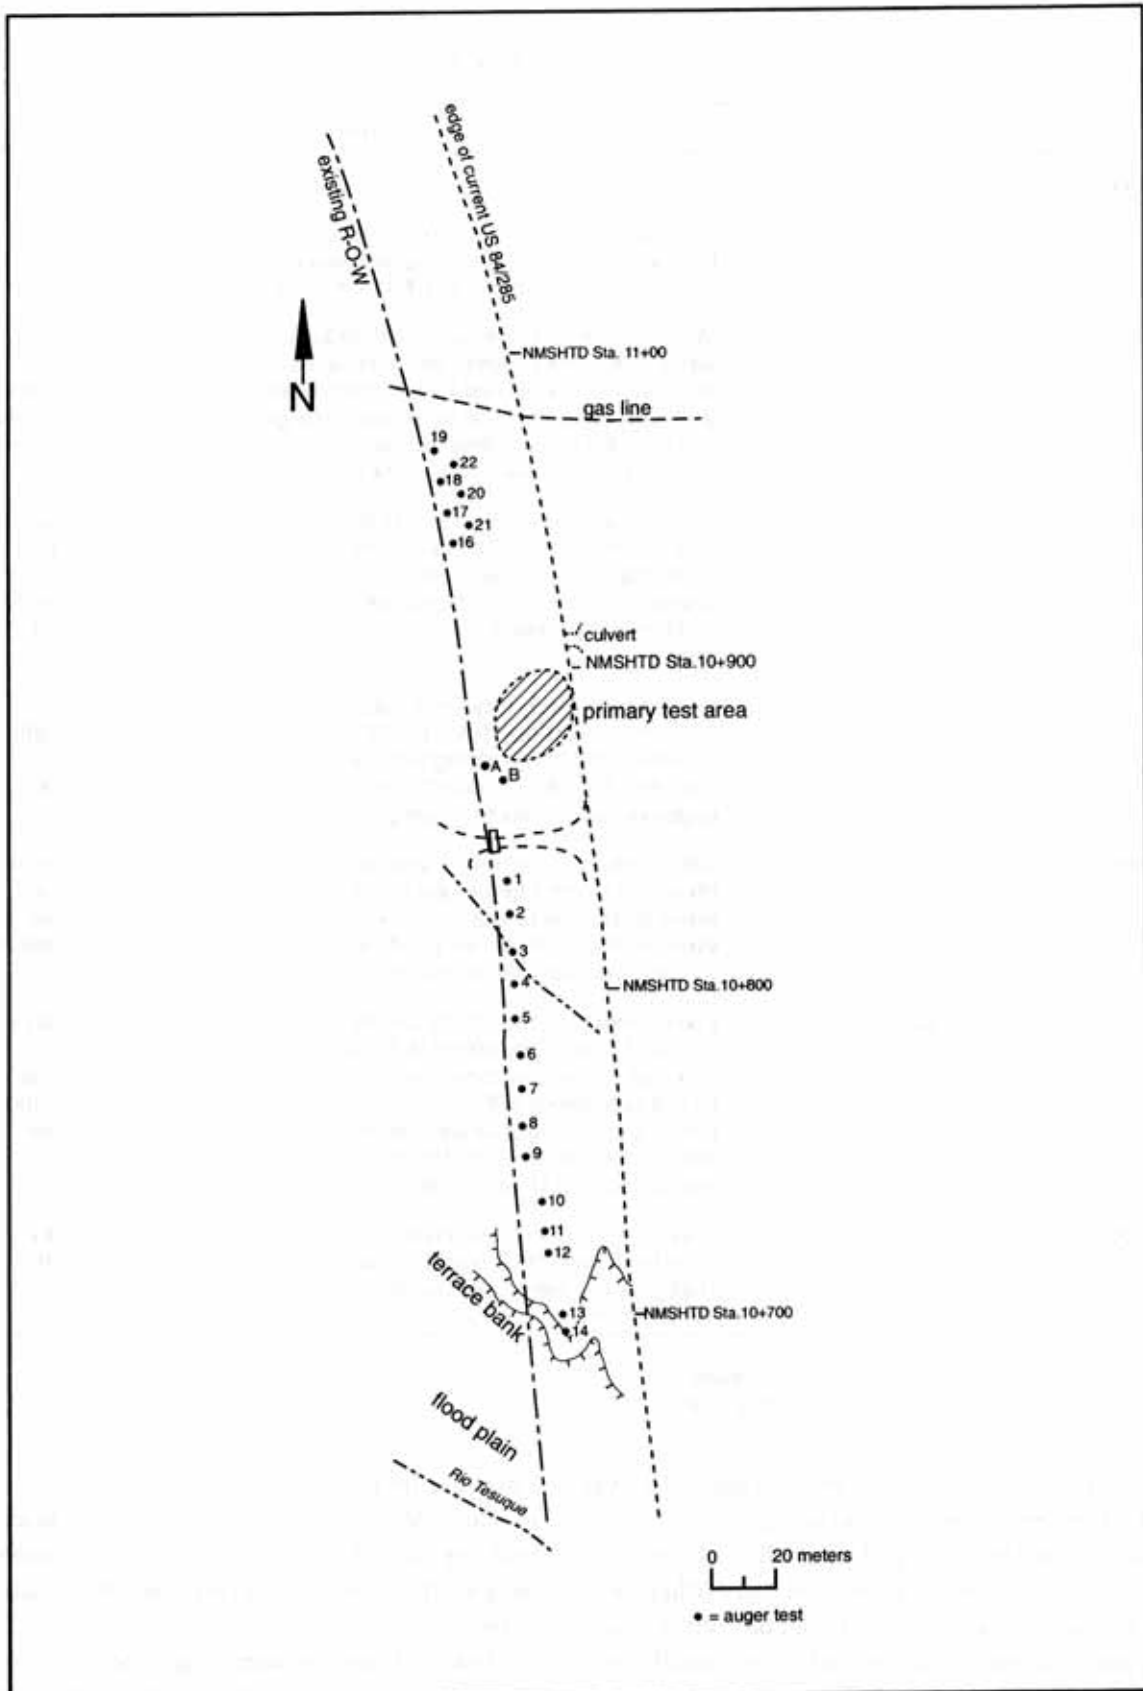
Plan of expanded auger testing, taken from NMSHTD construction plan.
